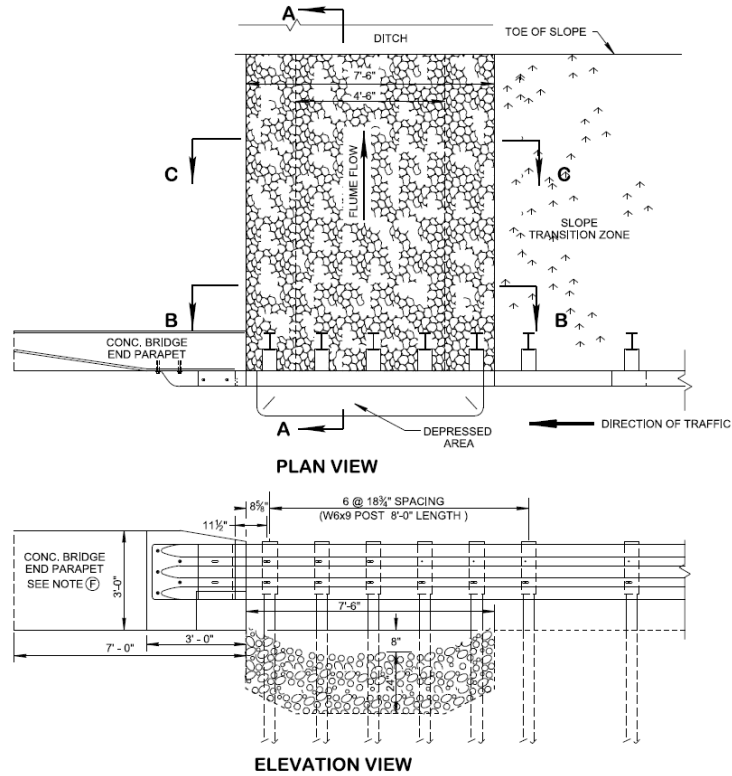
Modification of the Standard Transition Design with Posts Installed in Flume.
